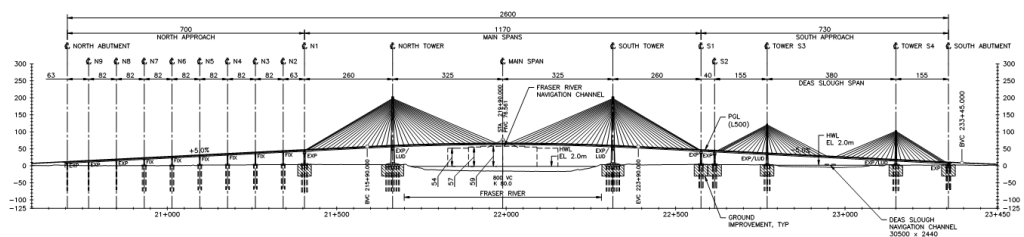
Bridge Option 2 with Cable-stayed Bridge over Deas Slough
